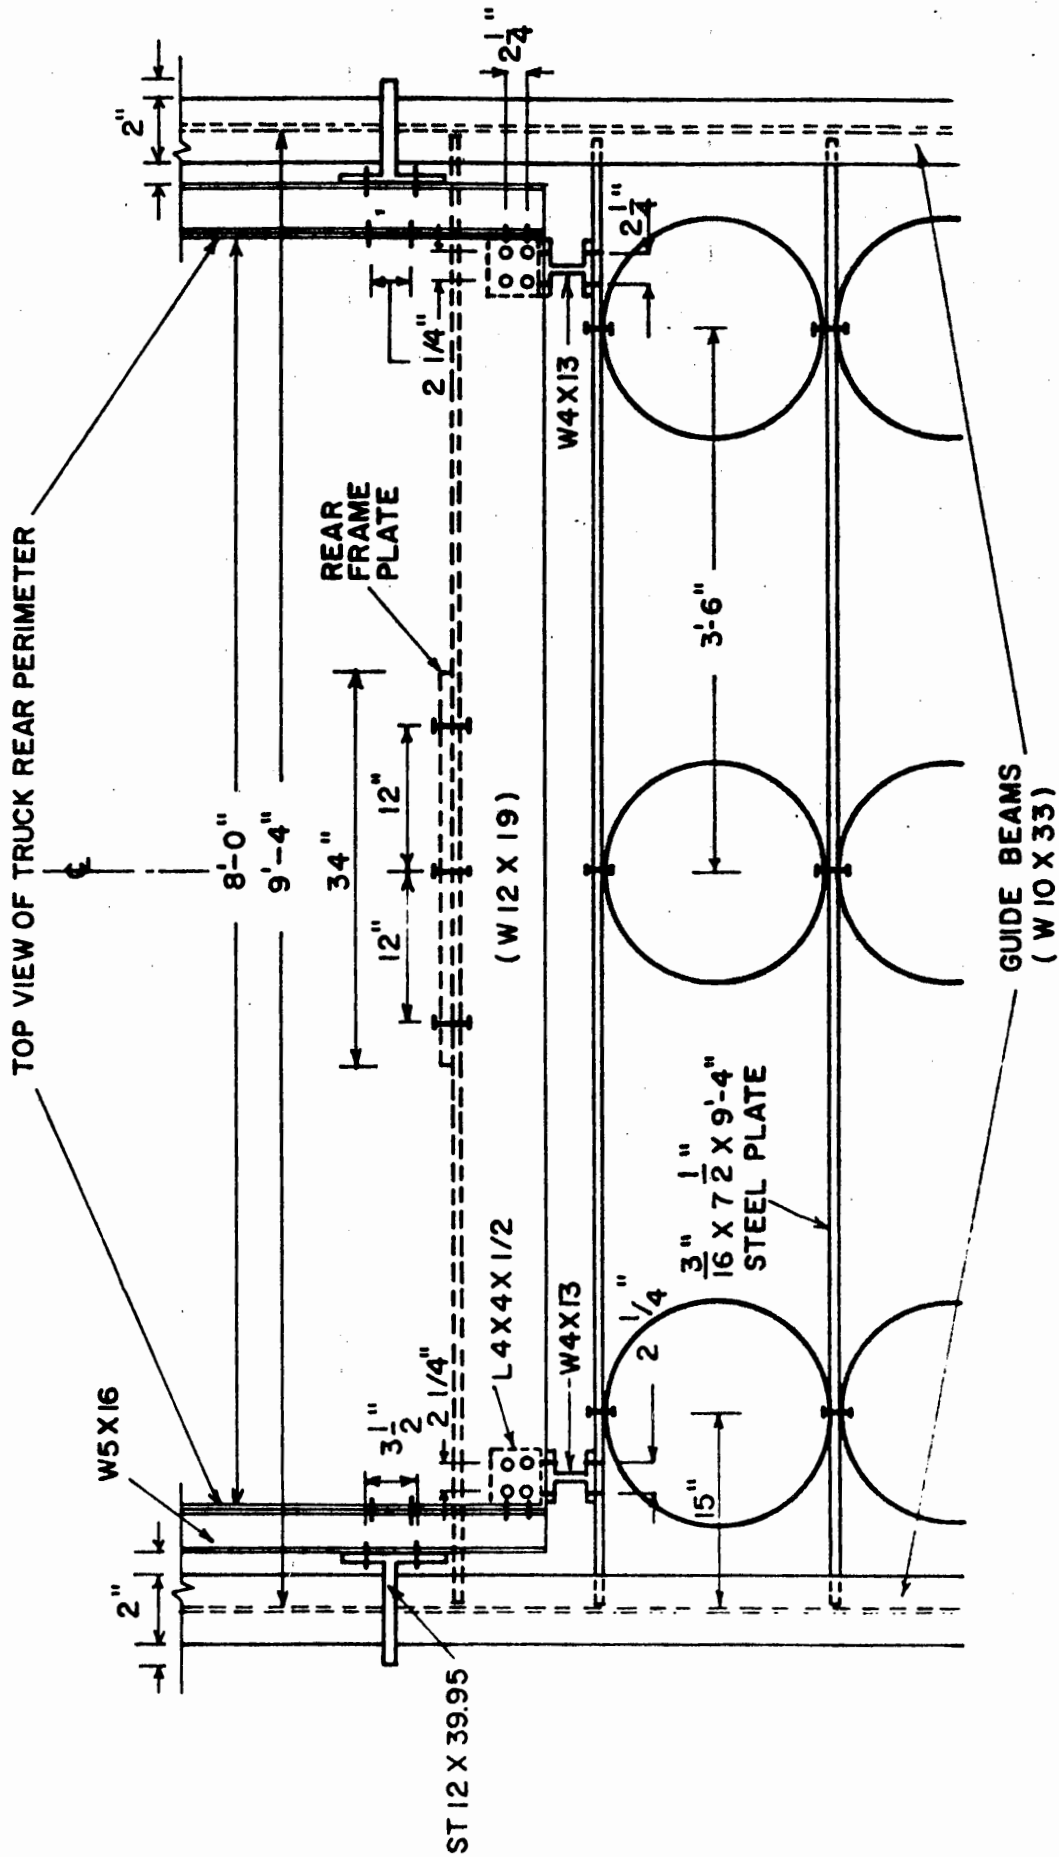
TOP VIEW ( ALL CONNECTIONS 3/4" DIA. HIGH STRENGTH BOLTS WITH 13/16" DIA. HOLES )
